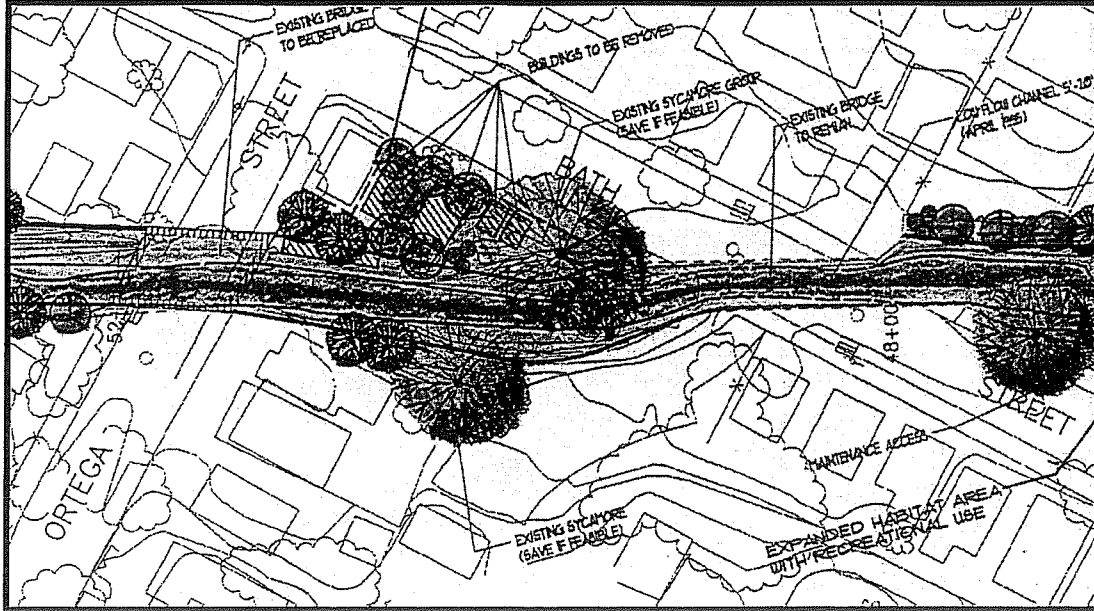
Ortega Street Bridge to Bath Street Bridge
